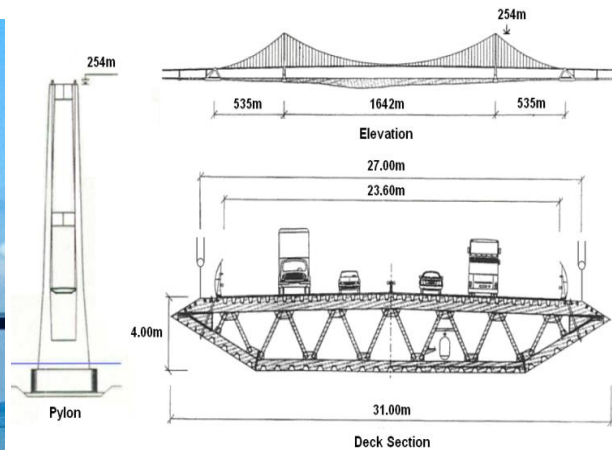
Dimensions of the Great Belt Suspension Bridge (Elevation, Deck section and Pylon) [15]
